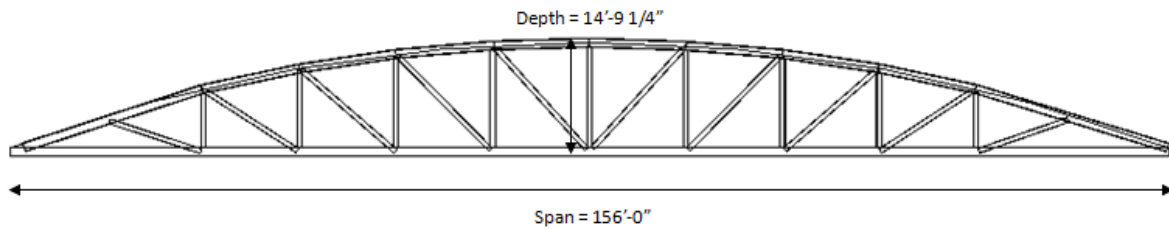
Long Span Truss Profile - Compton Family Ice Arena
